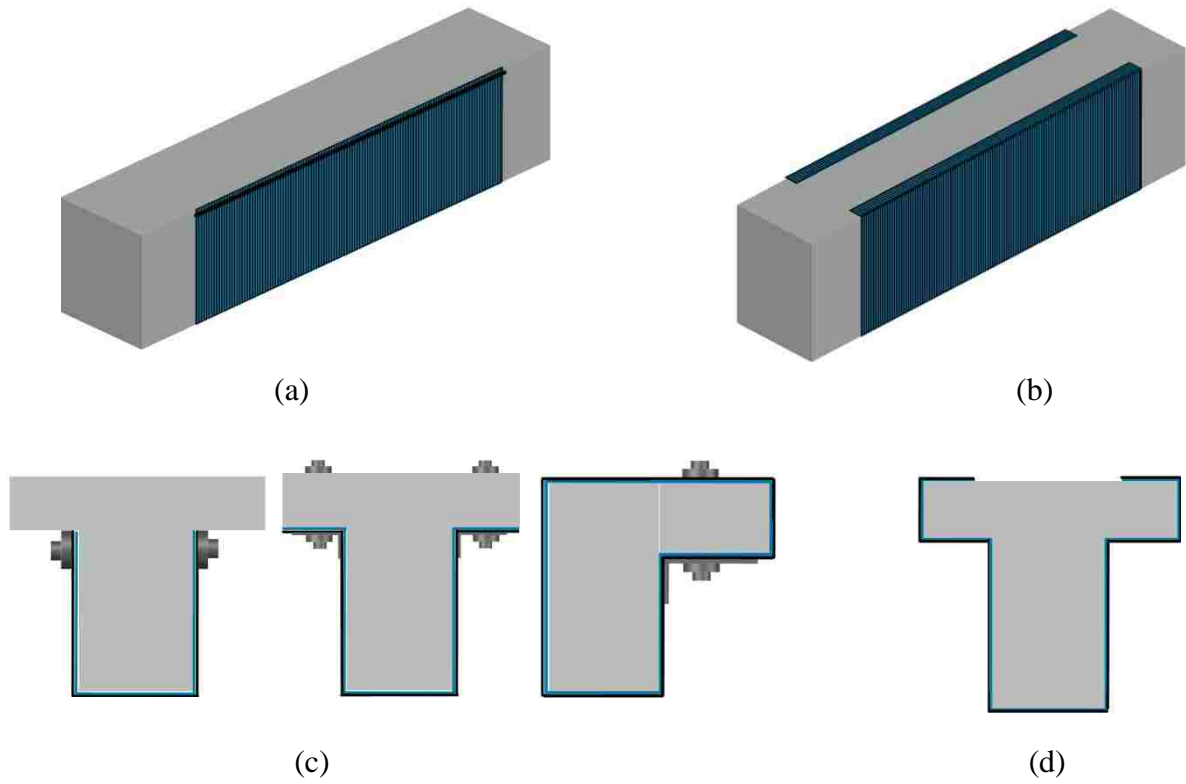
Anchorage system types (a) anchor bar, (b) composite fastened to the top of the beam for rectangular section, (c) steel angle, (d) extended u-jacket for T-section.
